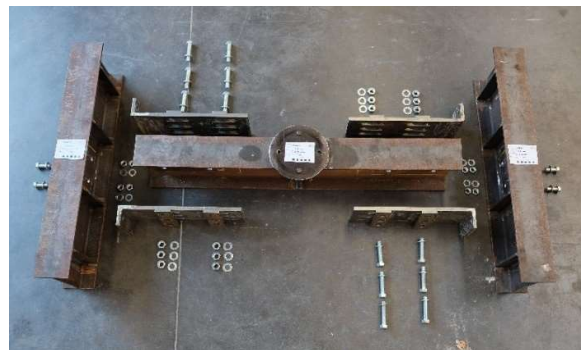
Photo shows a kit consisting of a steel beam and connecting elements (the two primary beams are excluded in the kit)
